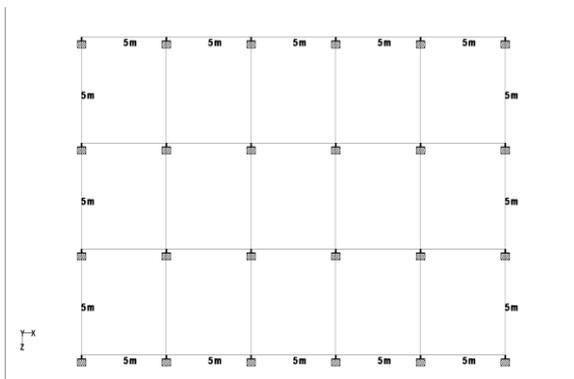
Typical Floor Plan for all 9(G+8) Floors
